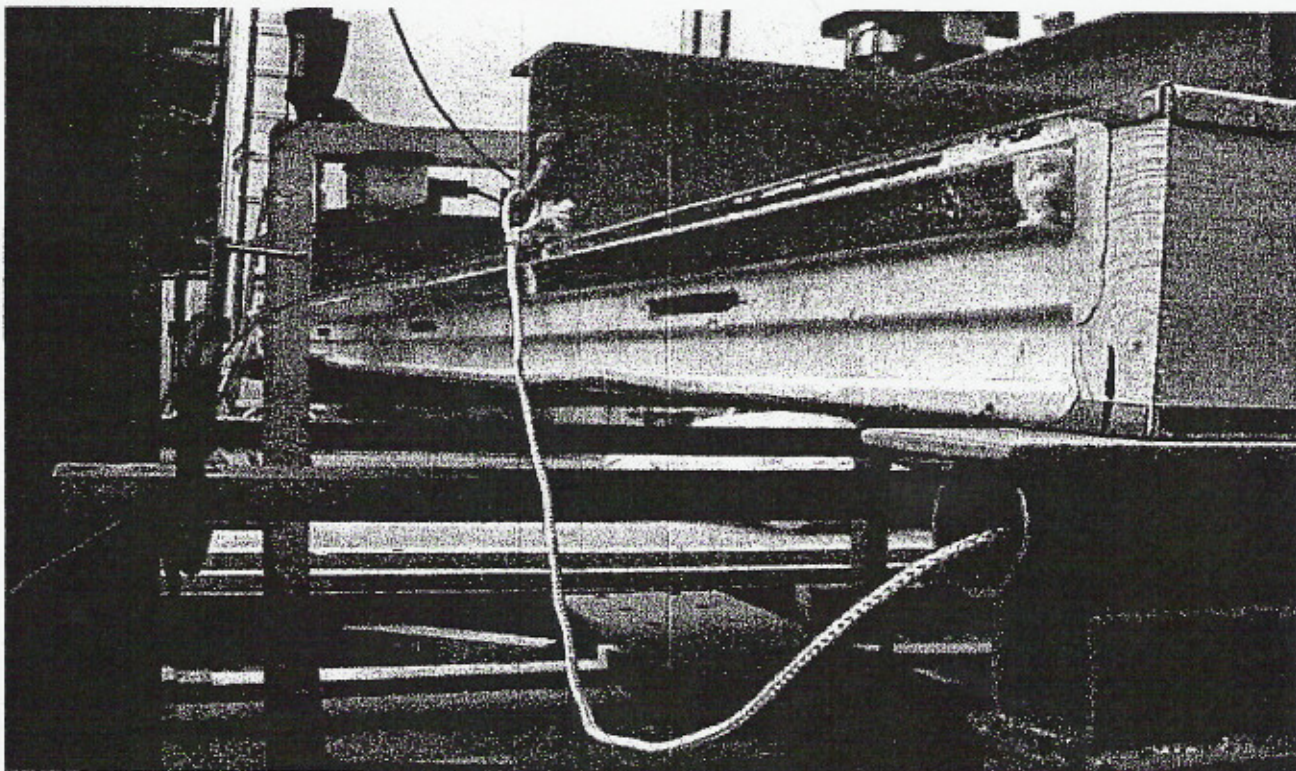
Response of 8' Galv.-Galv. Panel Under Transverse Loading
